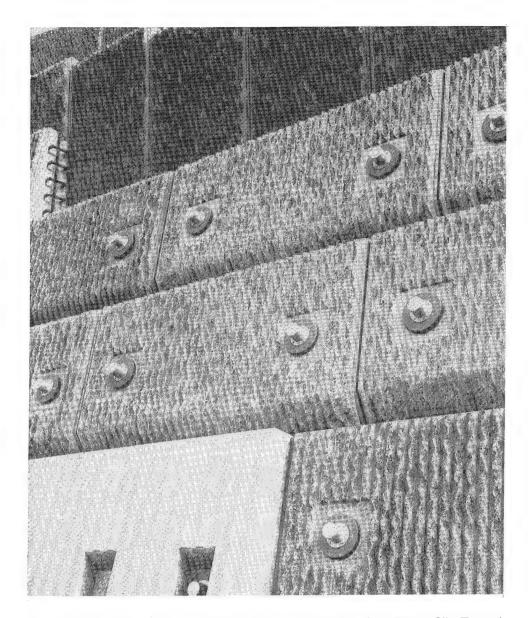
Close-up of the precast concrete panel wall at Pen-y-Clip Tunnel (from *Concrete* 1993)
